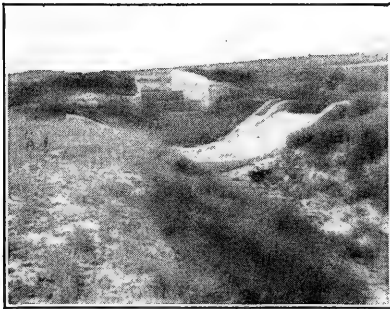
(c). Spillway and drop structure leading from spreader dike constructed by C.C.C. Steamboat demonstration area, Navajo Indian Reservation near Ganado, Arizona. Structures have prevented deepening of the channel but will soon fail unless repaired.
